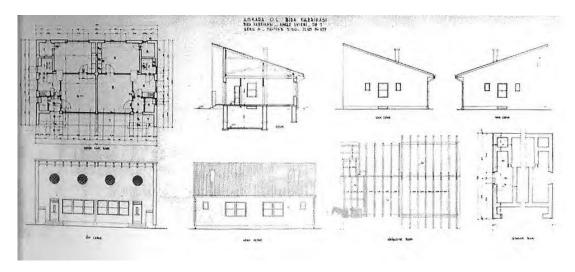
Drawings of the dwellings of workers, Ernst Egli, 1937 (Source: Alpagut, 2010)
